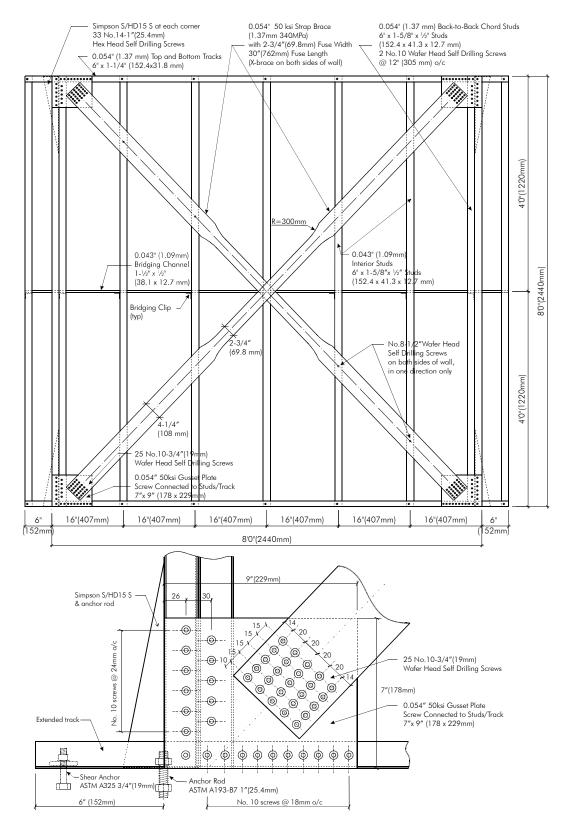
Nominal dimensions the corner detail of specimens 27A-M and 28A-C
